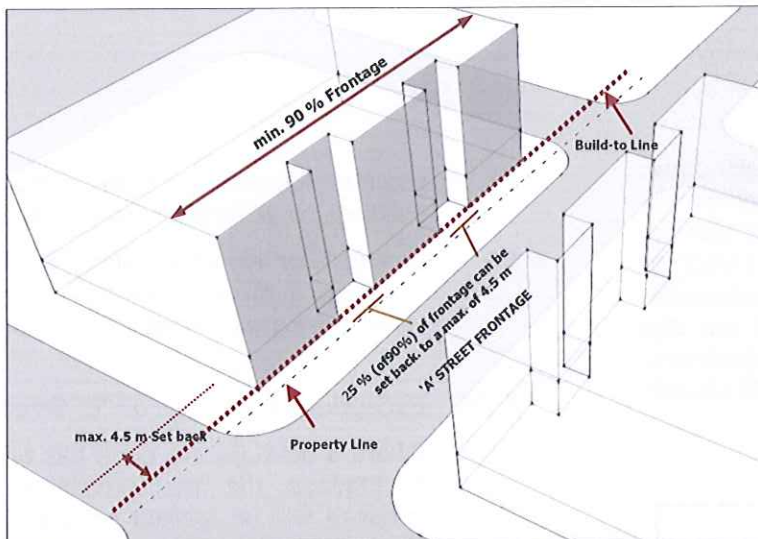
Illustration of a building streetwall positioned on 'A' Street frontages
